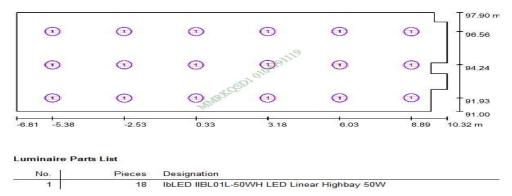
Luminaire Layout of Signal Processing Demonstration Bench
